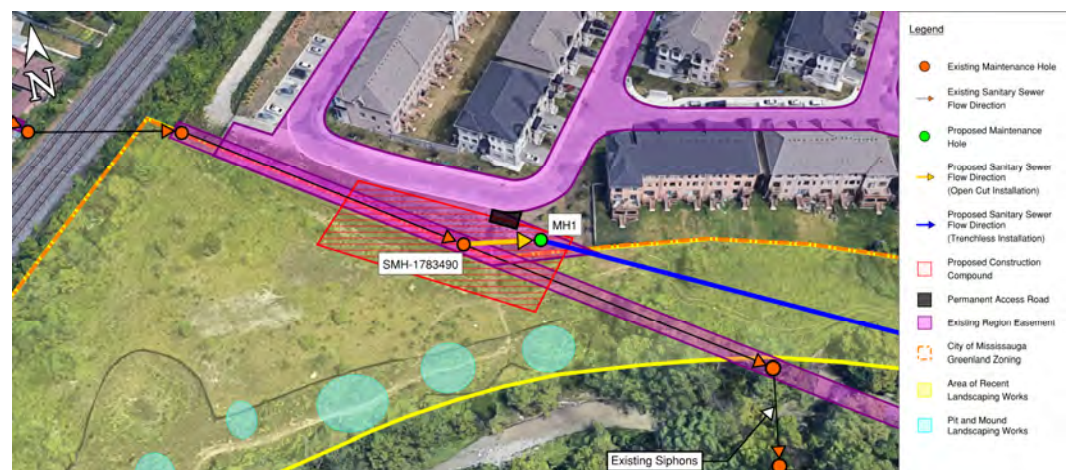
Alternative 3B – Entry Shaft Location off Beachcomber Road
